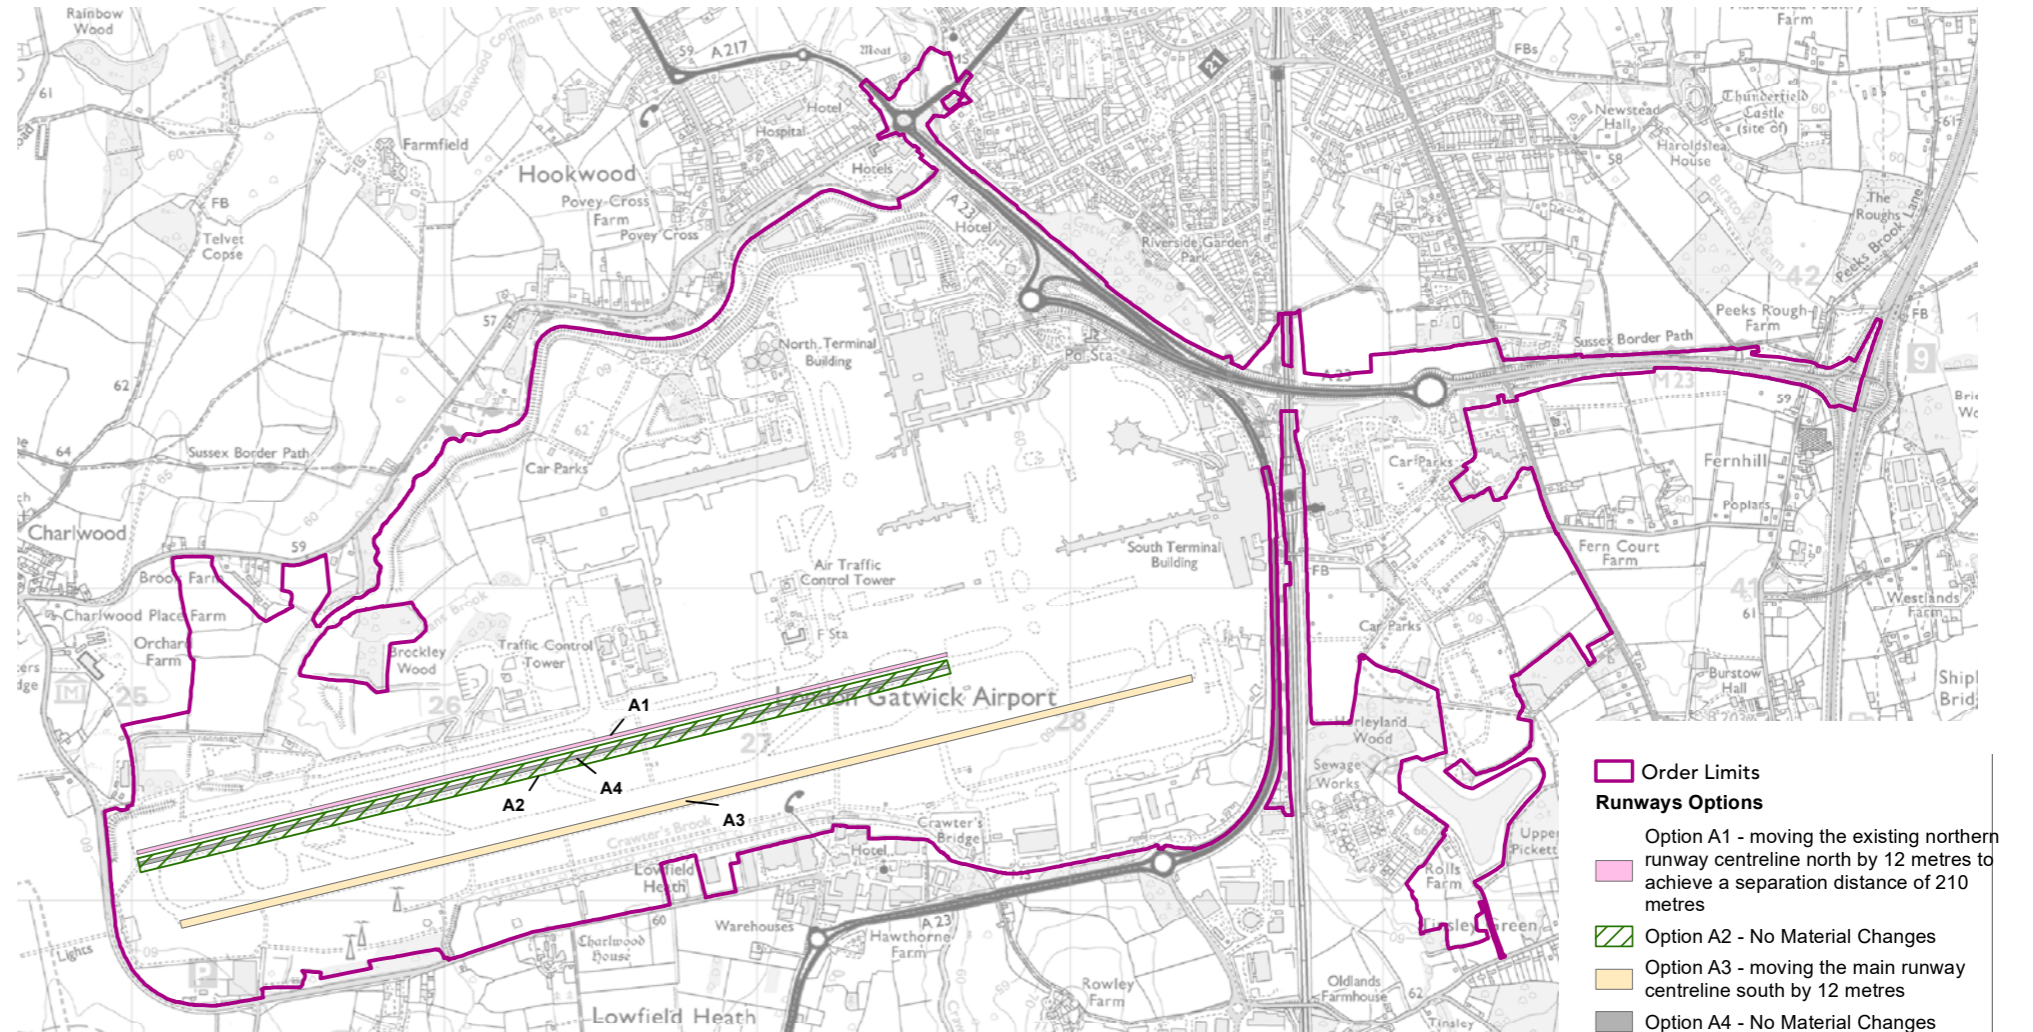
Runway Arrangement Planshowing the four options considered for the northern runway
